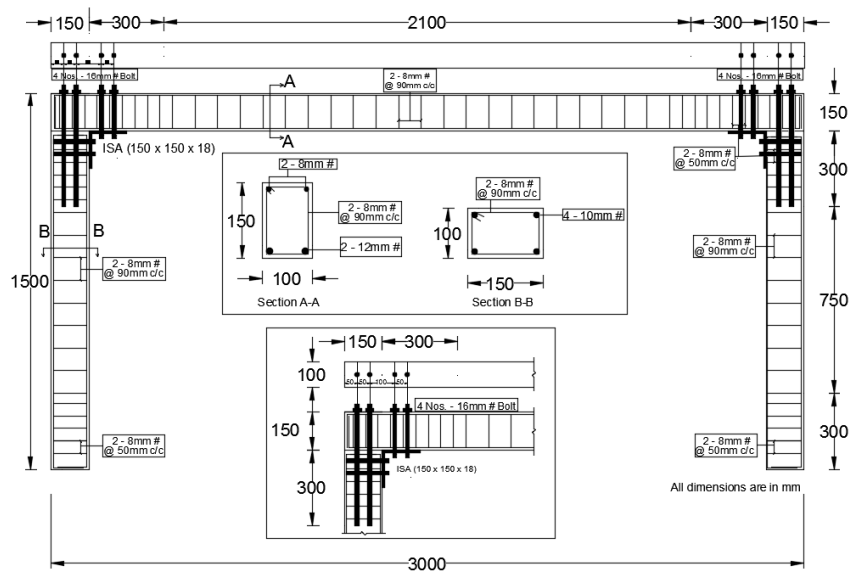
Reinforcement detailing of precast portal frame with seated angle (PC-1)
